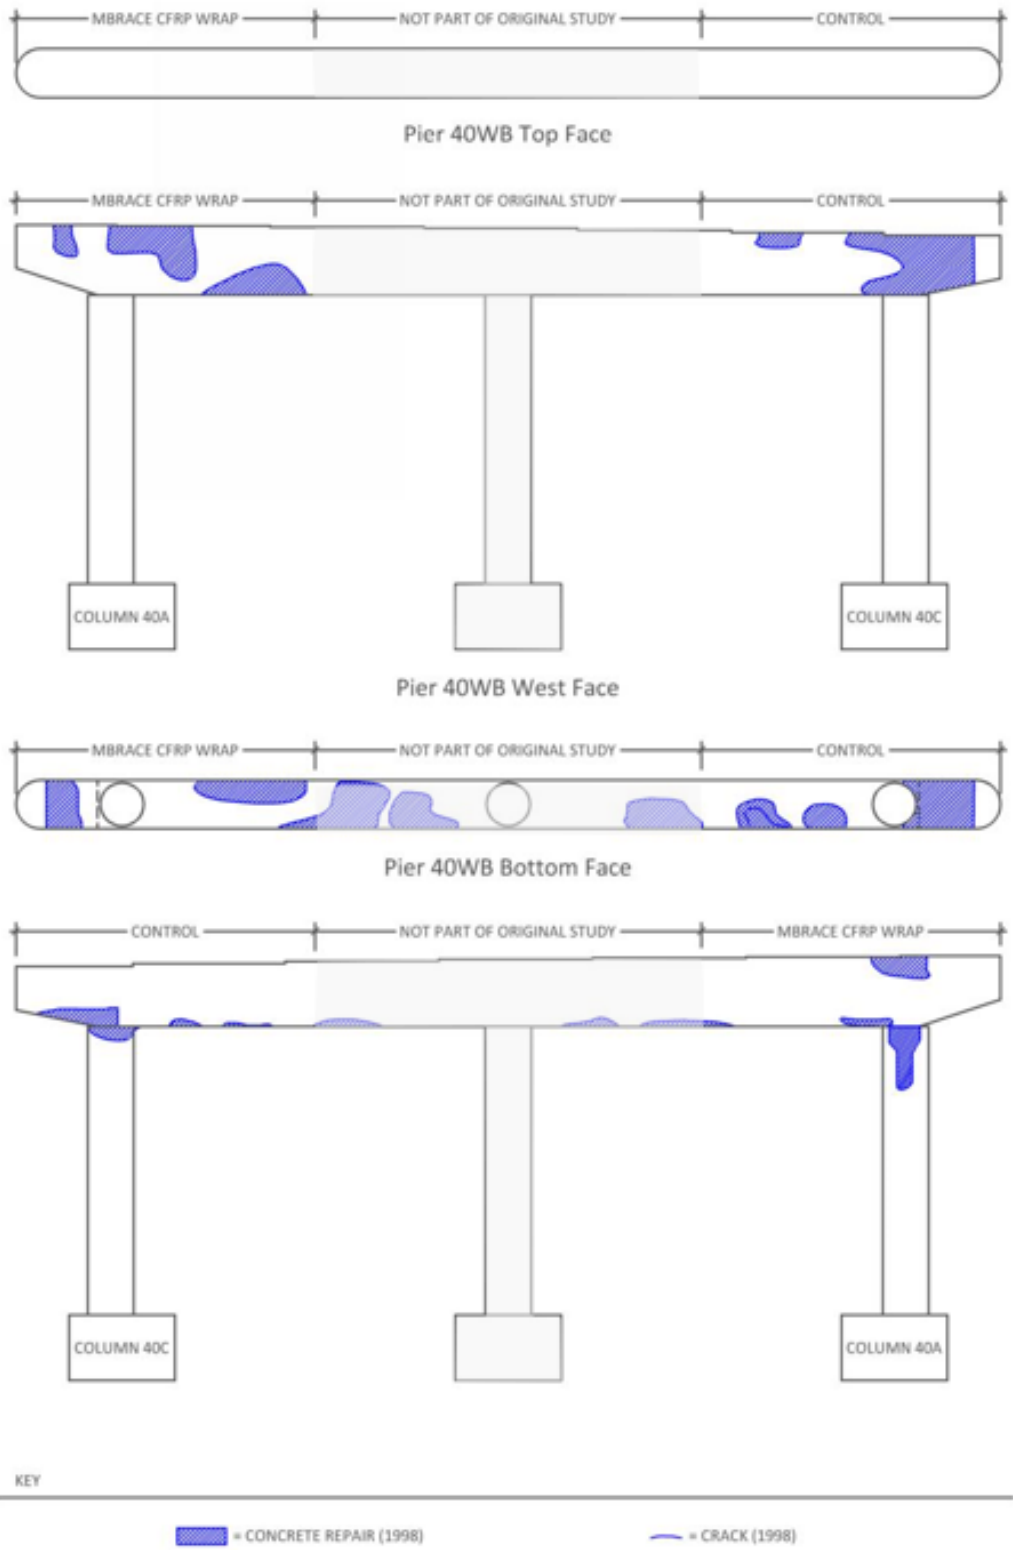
Pier 40WB - Areas of concrete distress and repair (blue shading) - 1998 study
